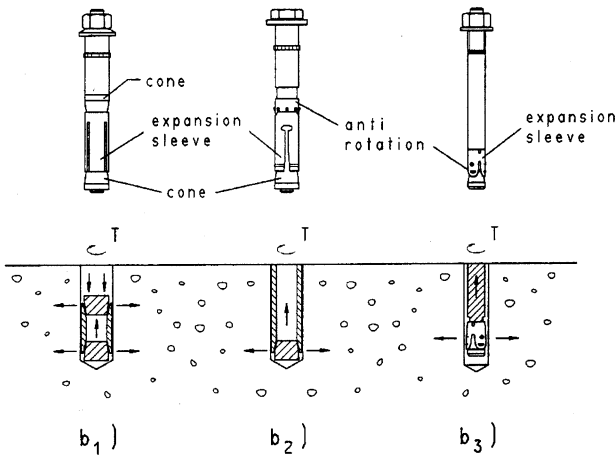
(b) — Fastening systems: torque-controlled expansion anchor (upper sketches show assembled anchors; lower sketches show anchor mechanism actions)
